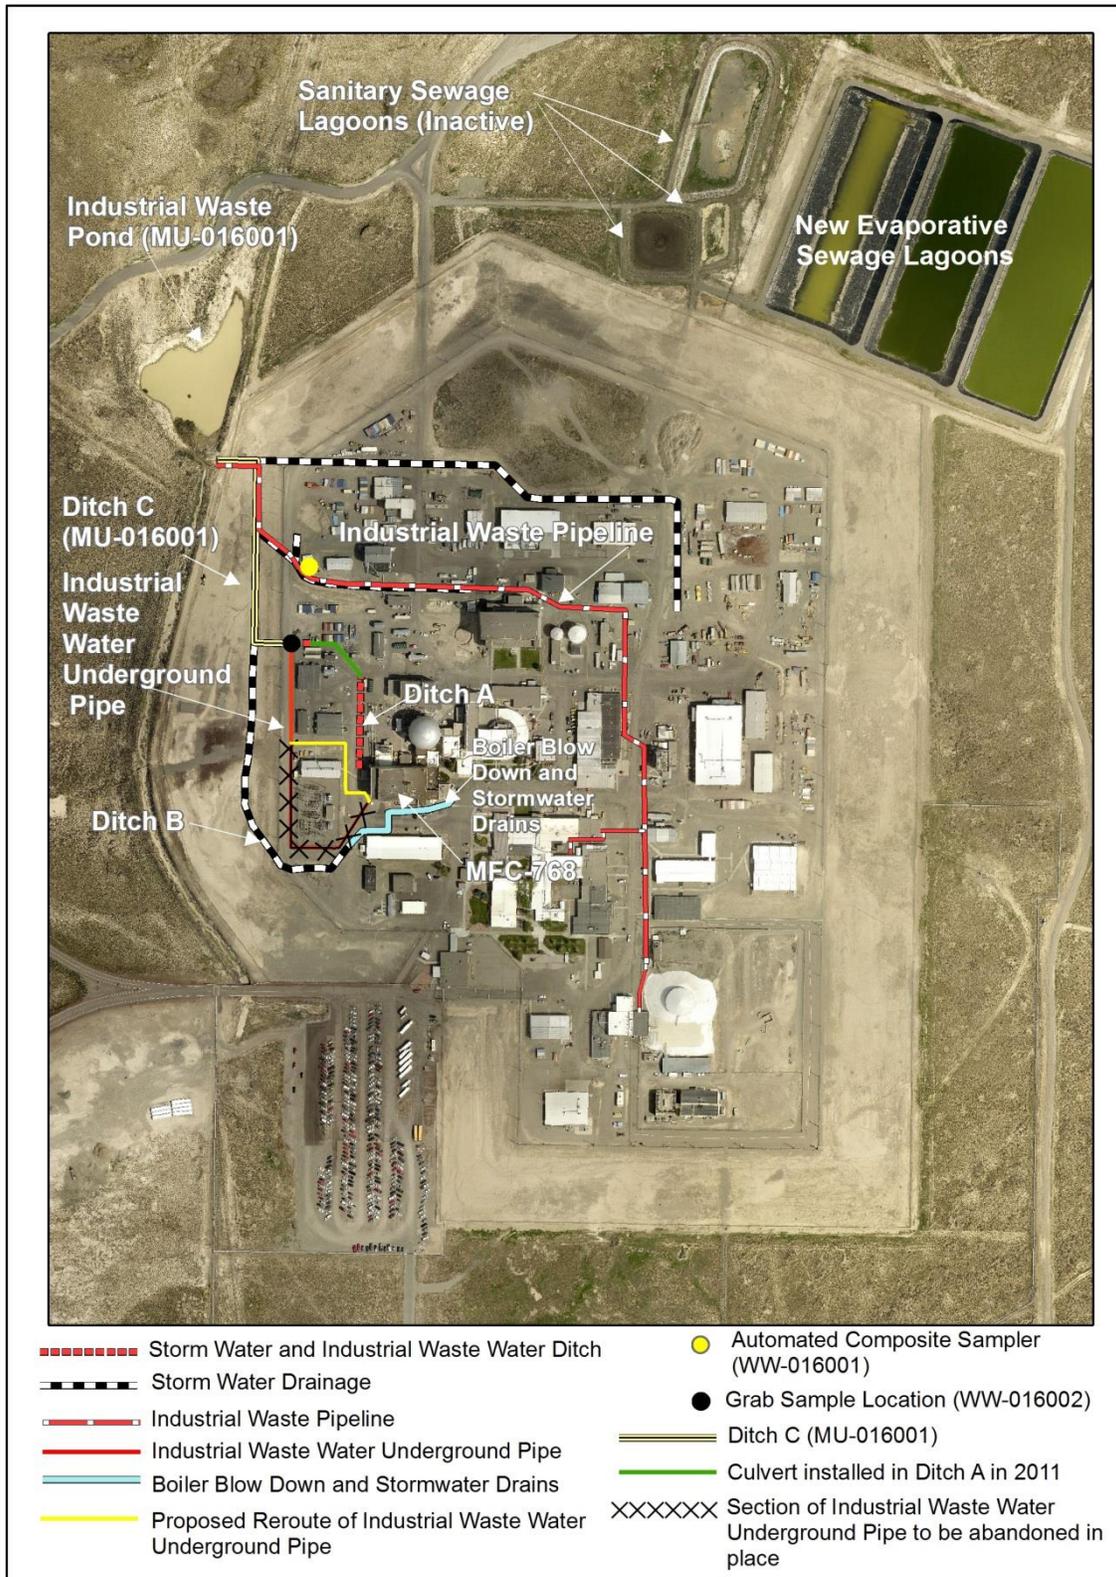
Proposed rerouting (yellow line) of a section of the industrial wastewater underground pipe. The line of Xs shows the section of current pipe that will be abandoned.
